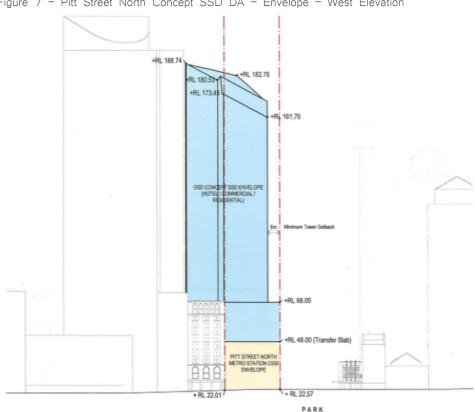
Pitt Street North Concept SSD DA - Envelope - West Elevation
